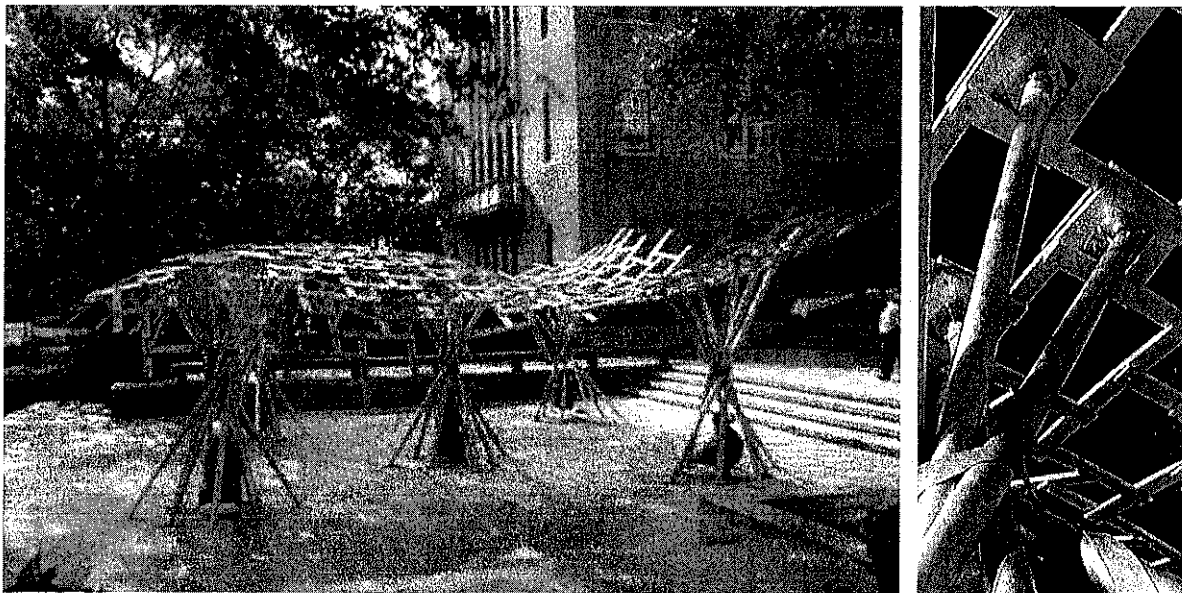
22 Bamboo Roof at Rice University in Houston, USA, 2002/03, Shigeru Ban Architects (ref. Shigeru Ban Architects)
